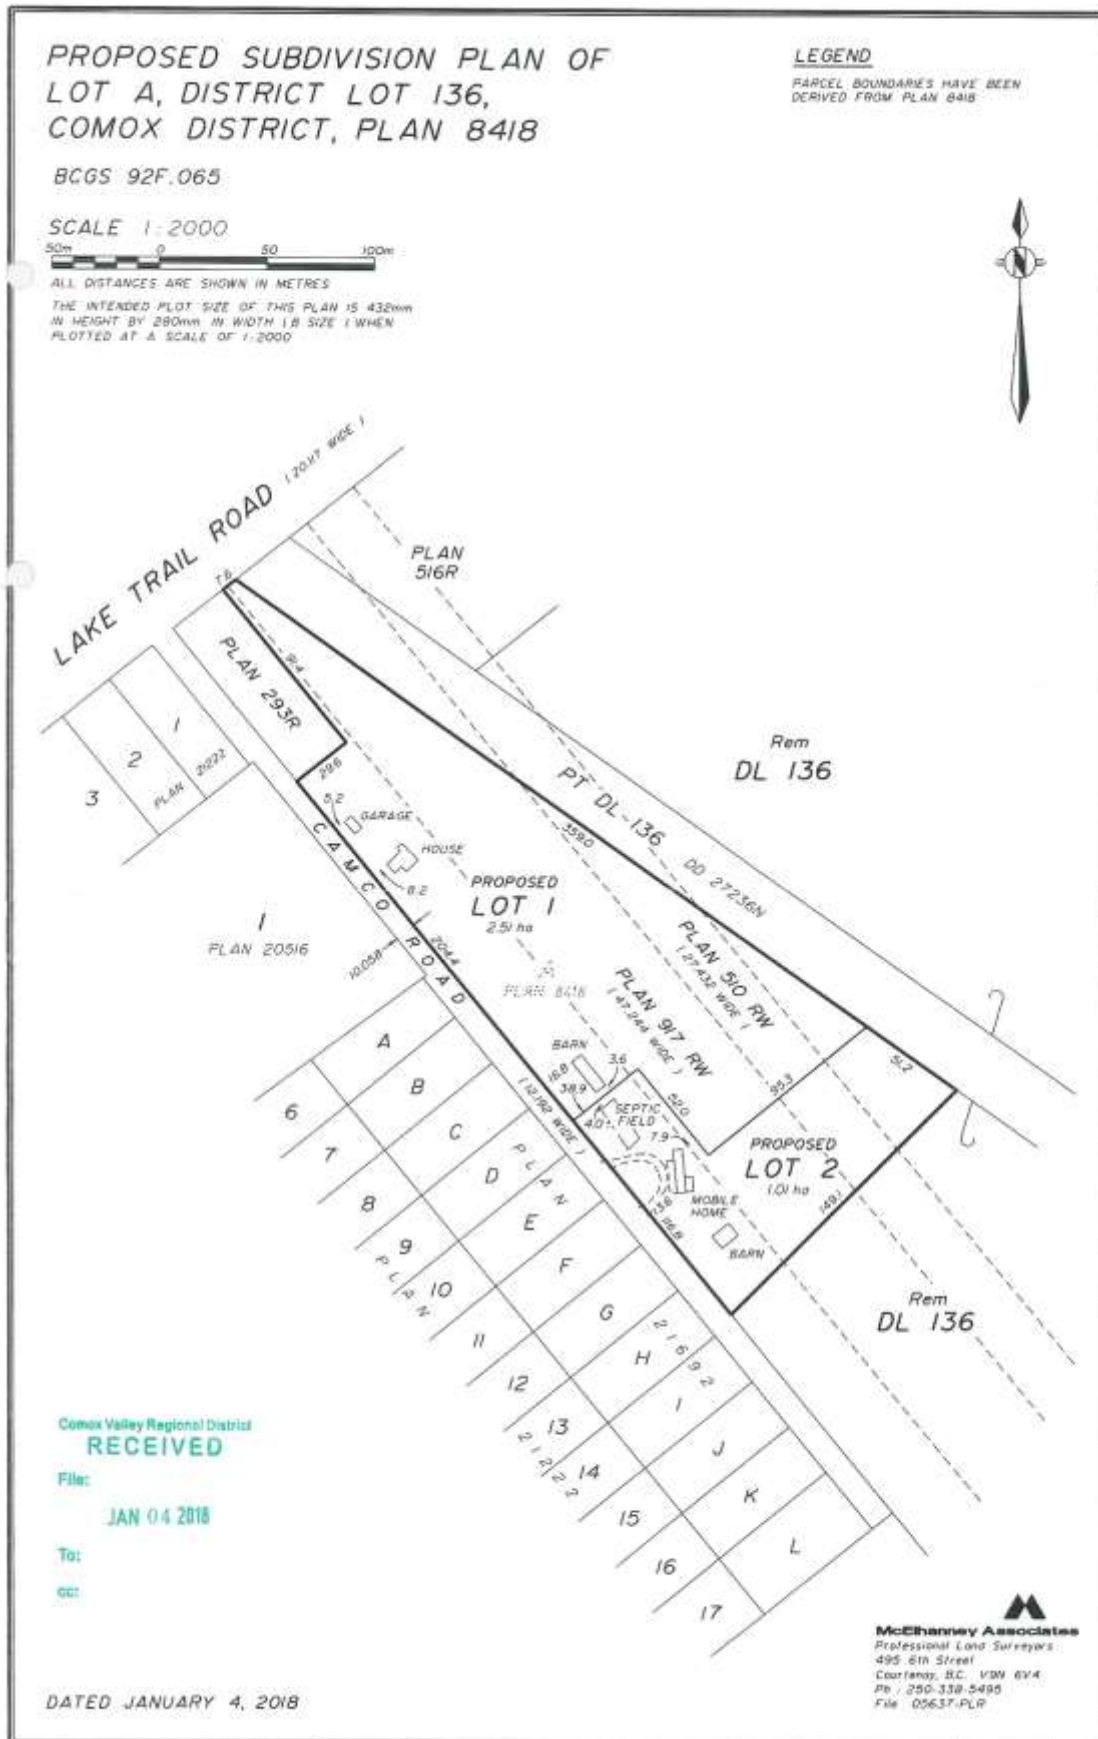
Proposed Subdivision Plan if Rezoning were to be Successful
